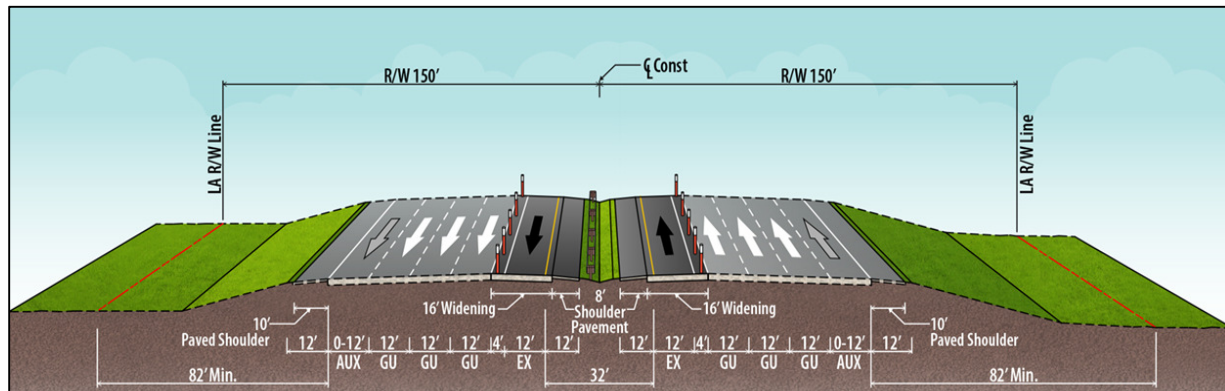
I-275 Mainline Starter Project Build Alternative Typical Section from south of Gandy Boulevard to Roosevelt Boulevard (Segment C-SP1)
